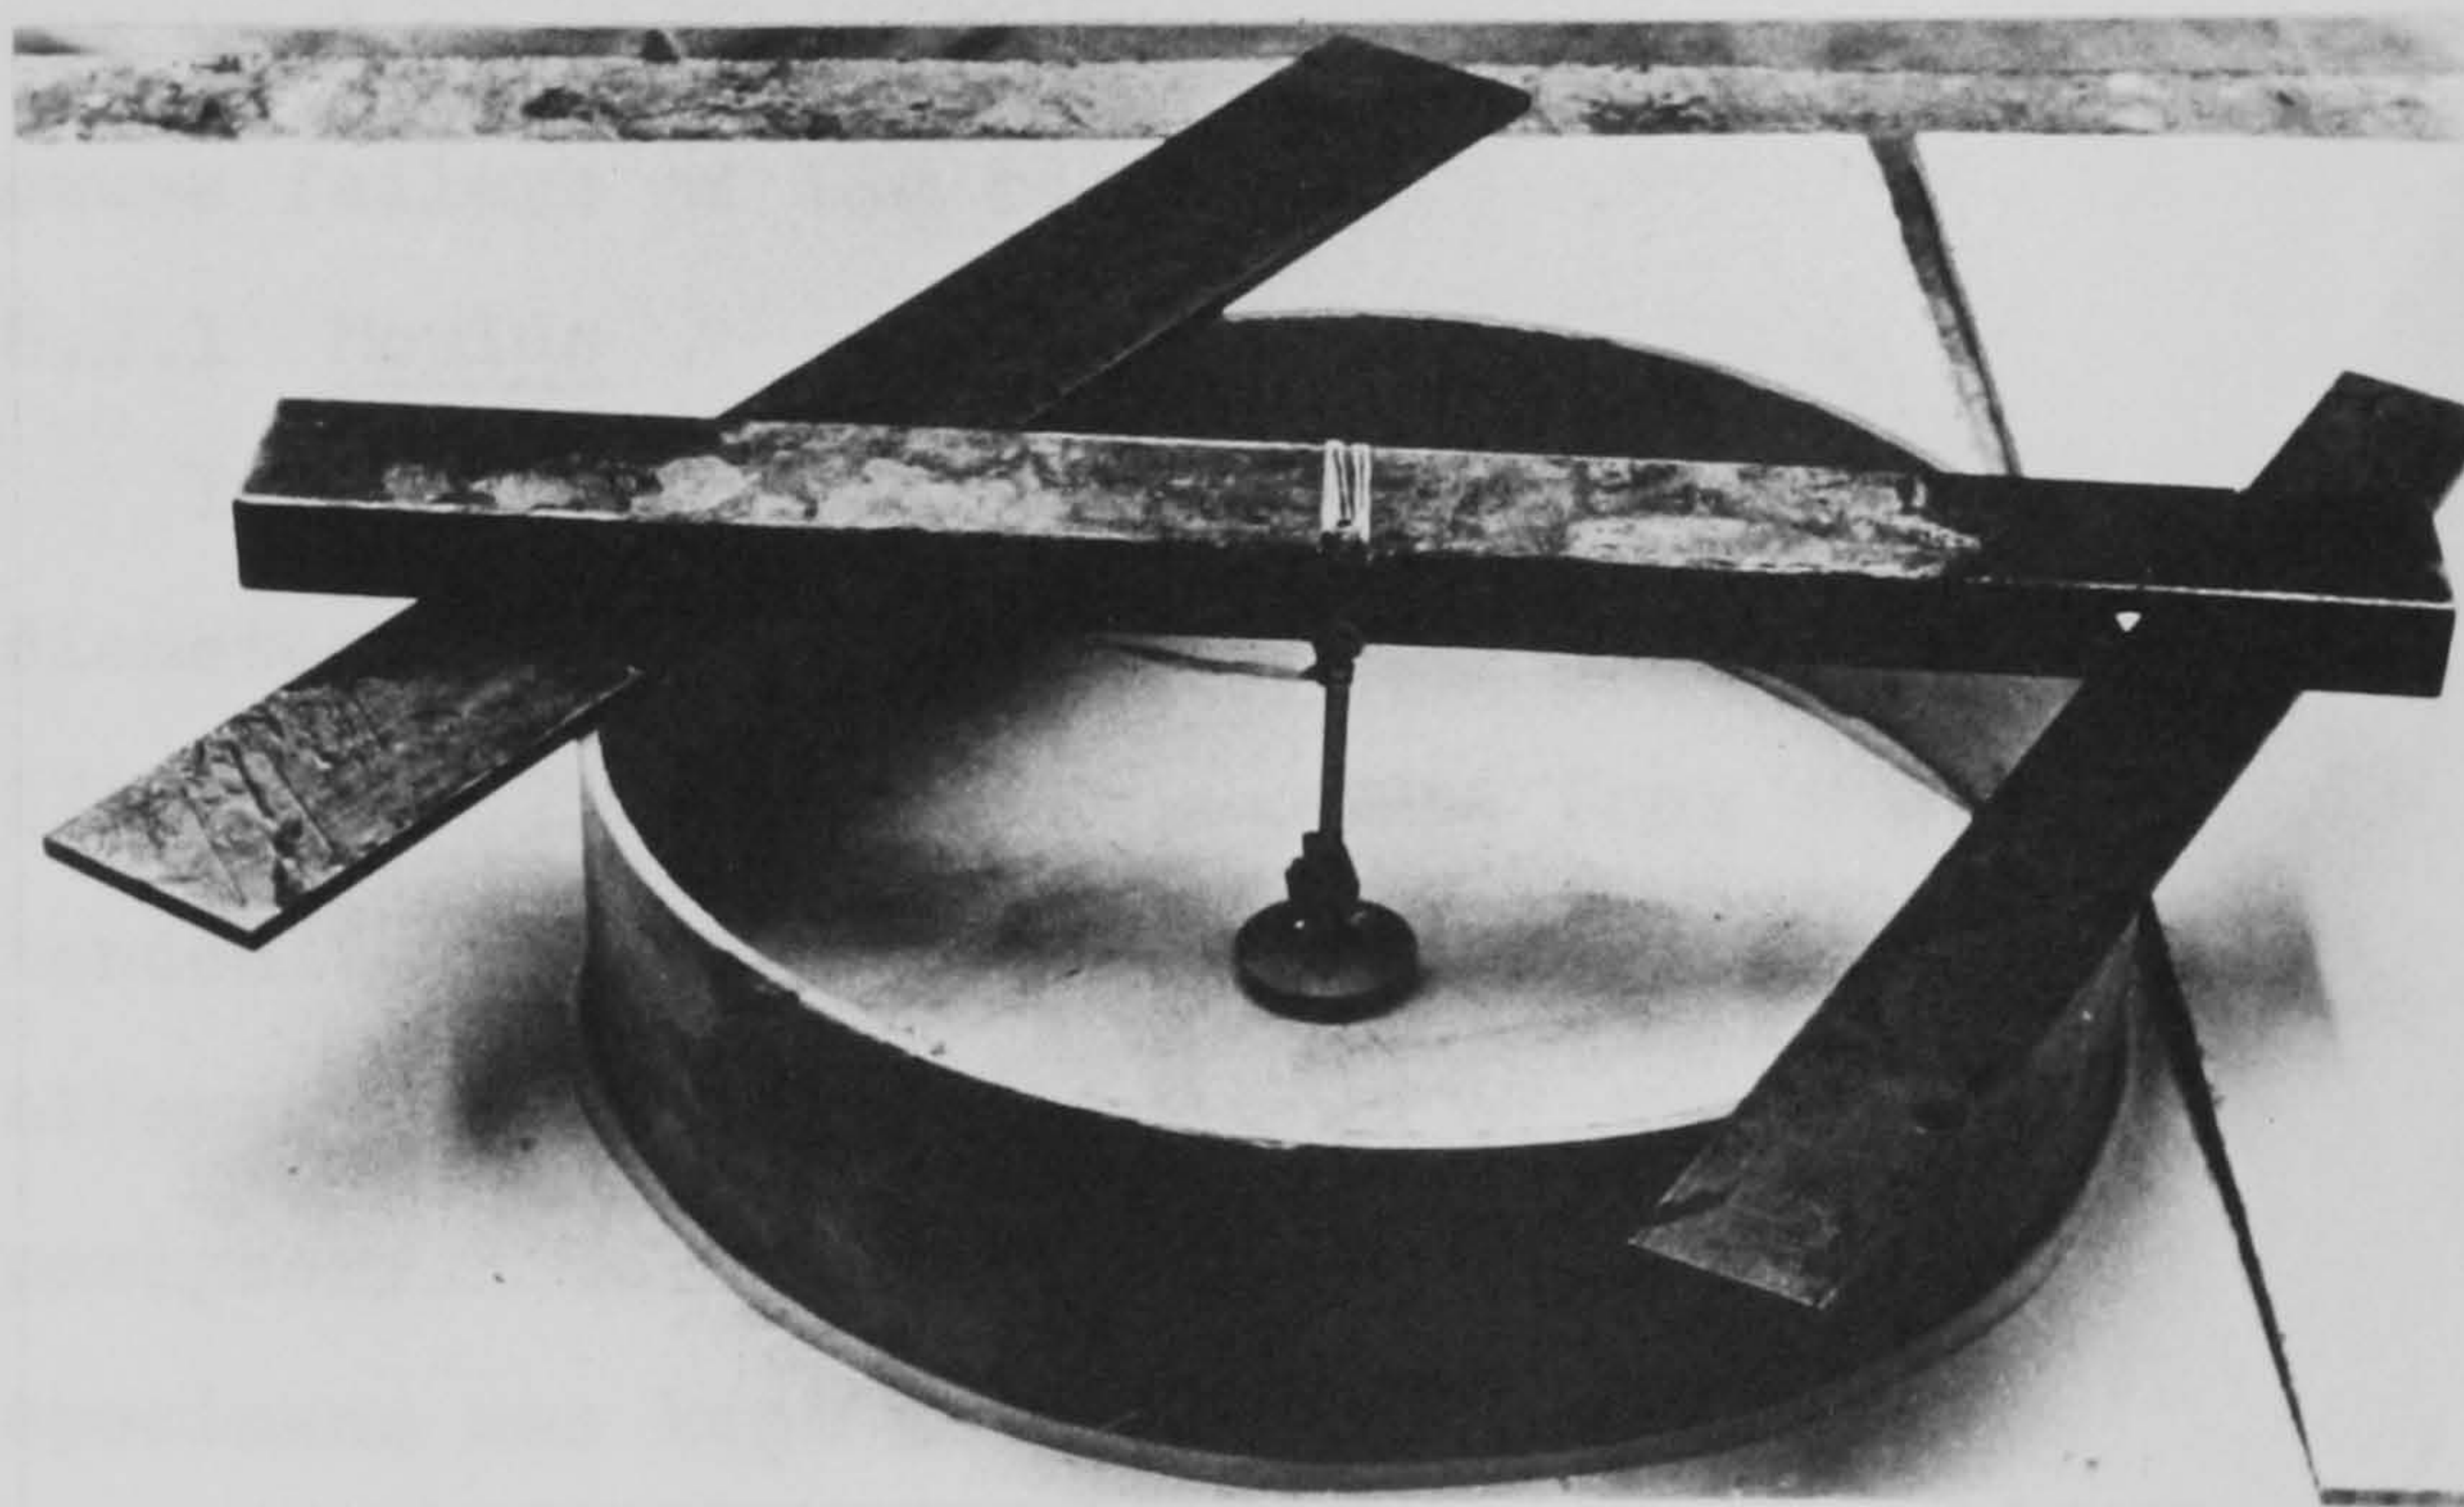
MOULD PRIOR TO CASTING SHOWING CRACK FORMER AND PRESSURE TUBE
